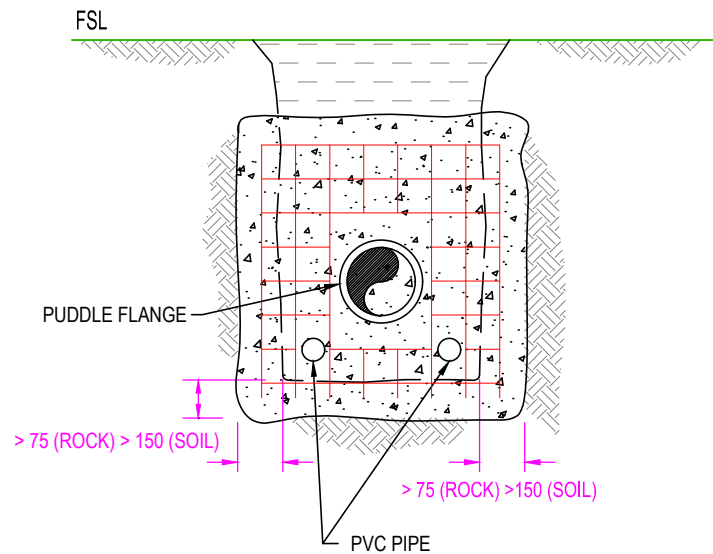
B: CONCRETE BULKHEAD (ELEVATION)
